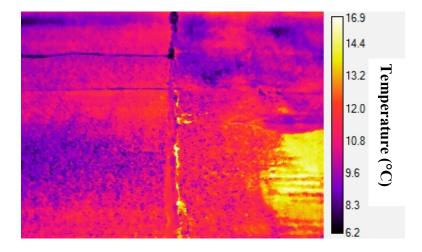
Asphalt and concrete pavement surface temperatures at 7:00 a.m.
